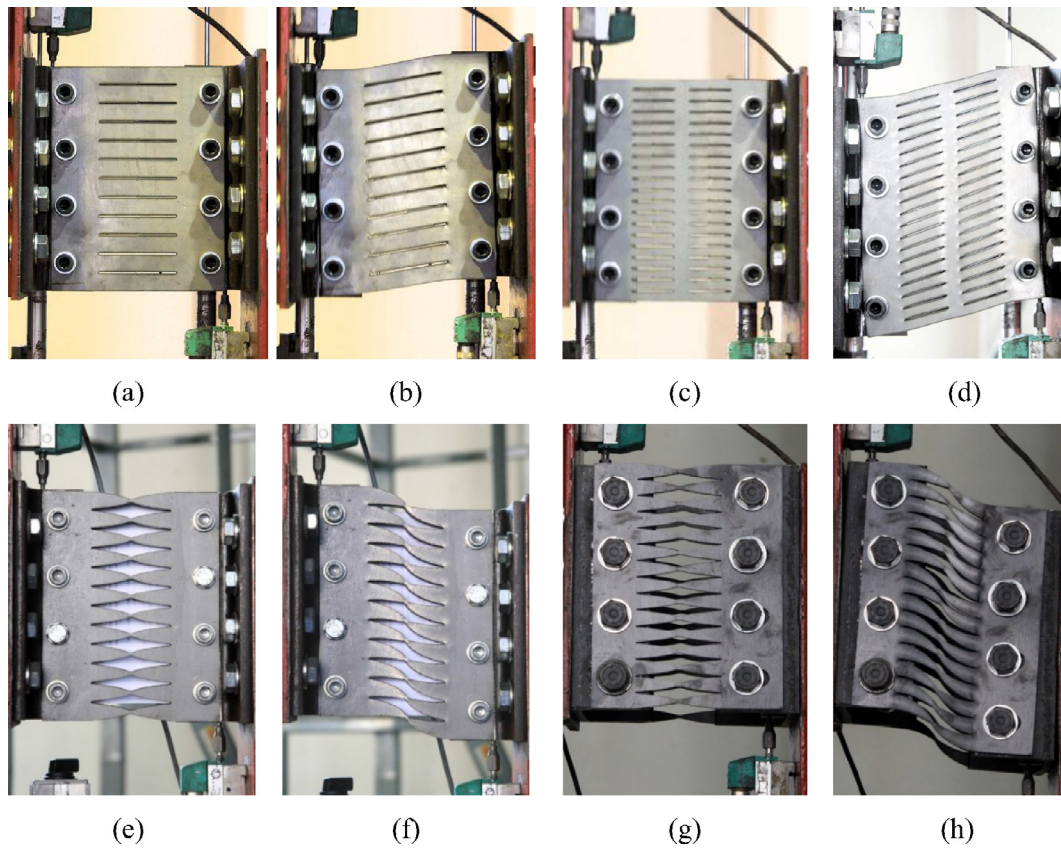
MSDs in the undeformed configuration and under test at maximum drift: (a, b) one line of beams (I); (c, d) two lines of beams (II); (e, f) hourglass-shaped beams (III); (g, h) hourglass-shaped beams and horizontal slots (IV).
